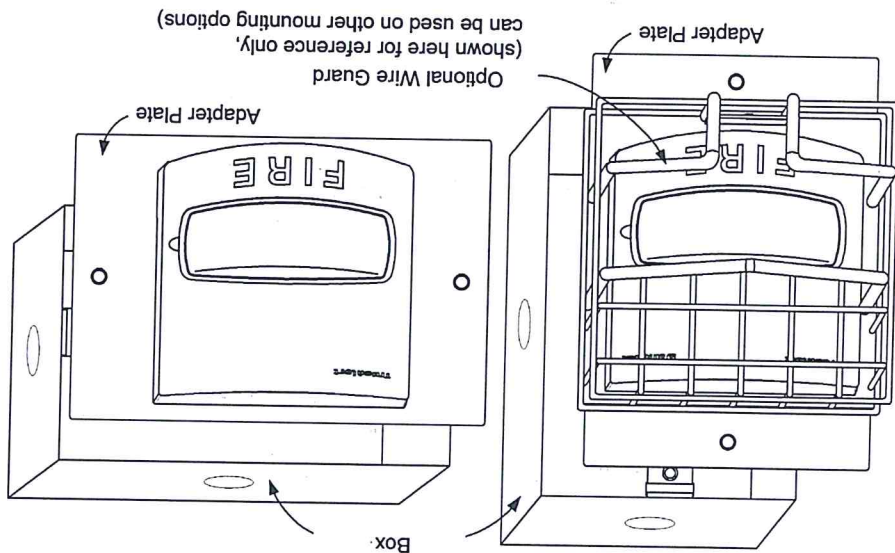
Wall Mount Installation Reference; Adapter Plate, Guard, and Adapter Skirt
